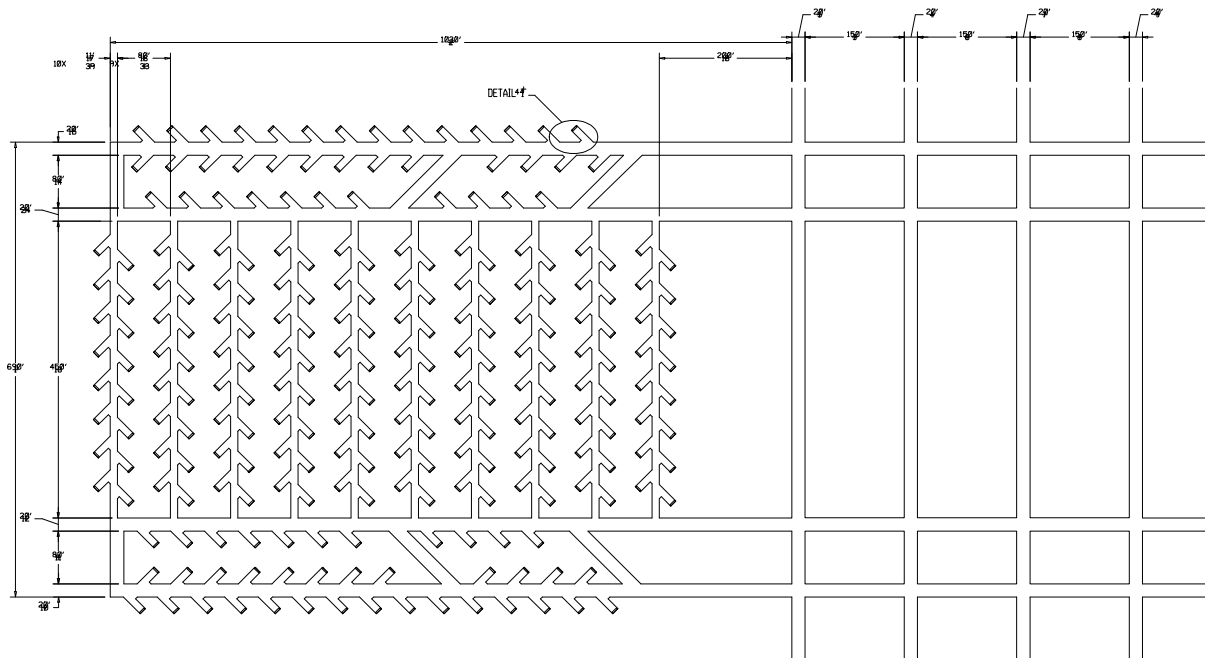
Enclosed Salt Repository Panel Concept Layout
